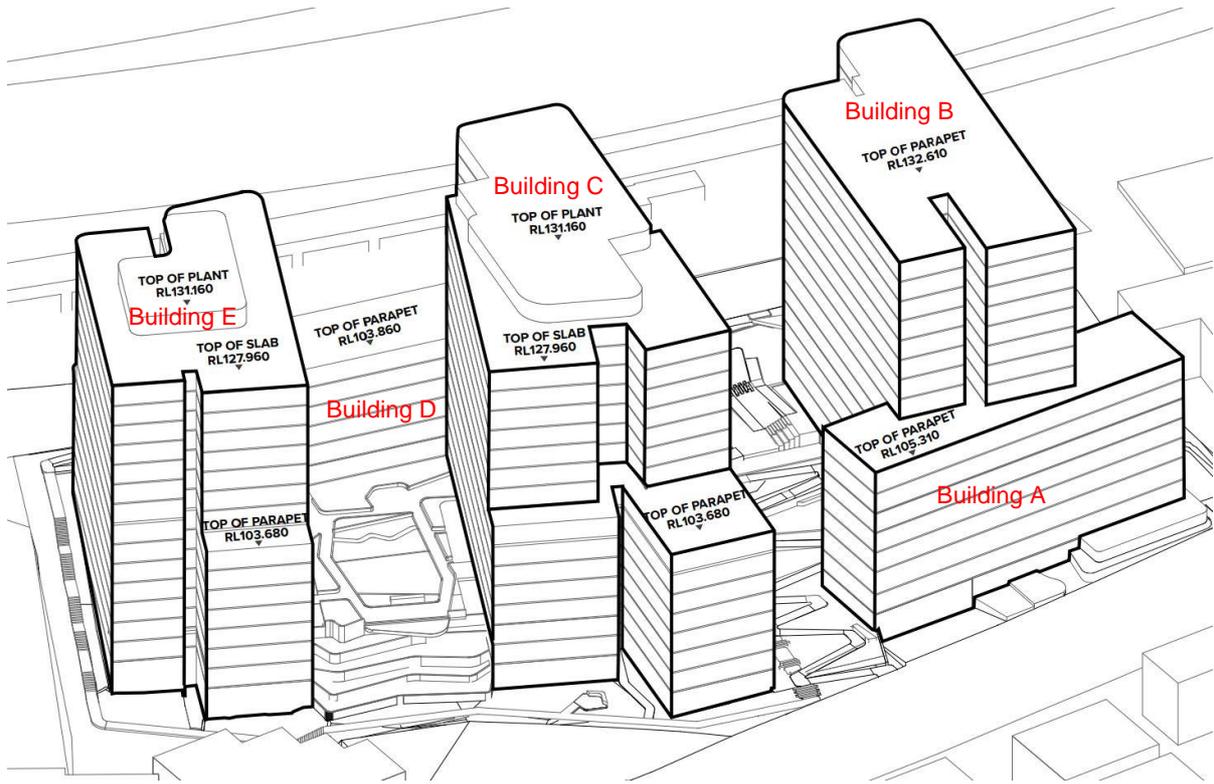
| Proposed modified building envelopes (Source: Applicant's EIS)
